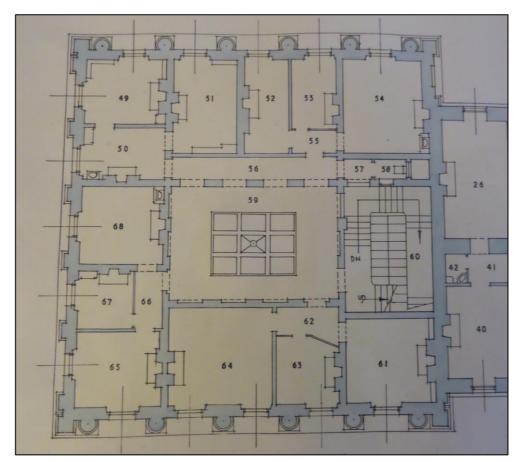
March 1946 7 Stone Buildings First Floor Plan
